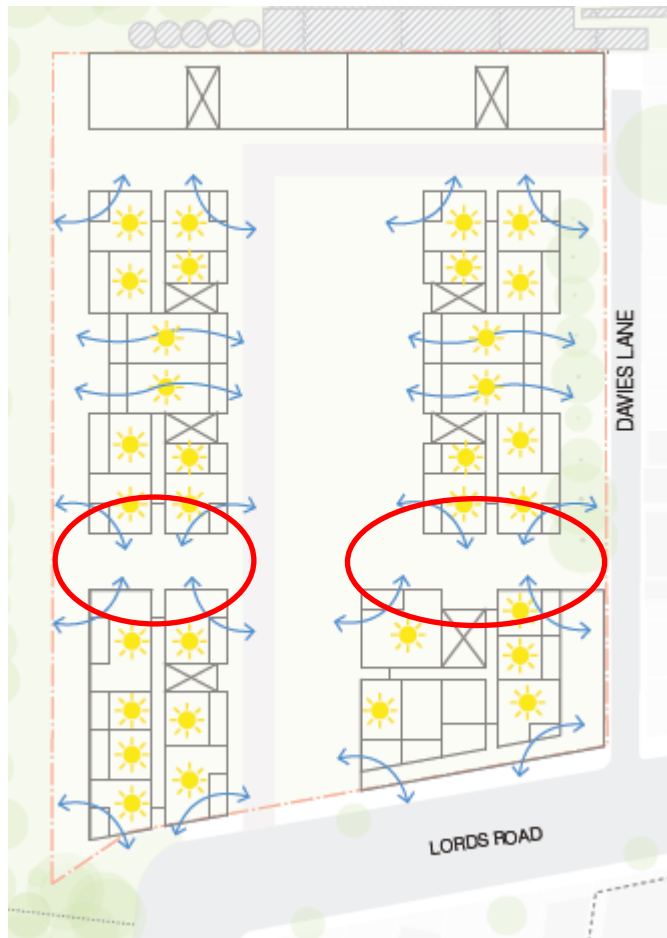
Proposed solar access and cross ventilation (Extract from page 24 of UDR)
